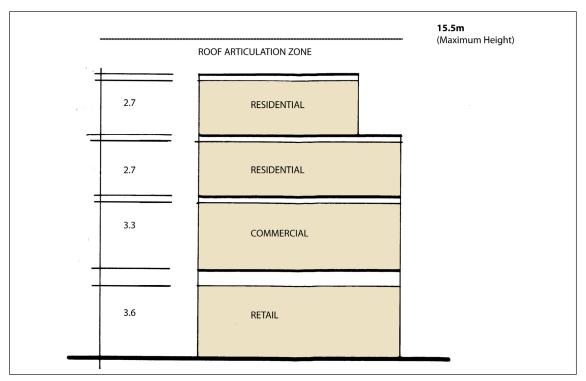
Minimum Floor to Ceiling Heights (Indicative)
